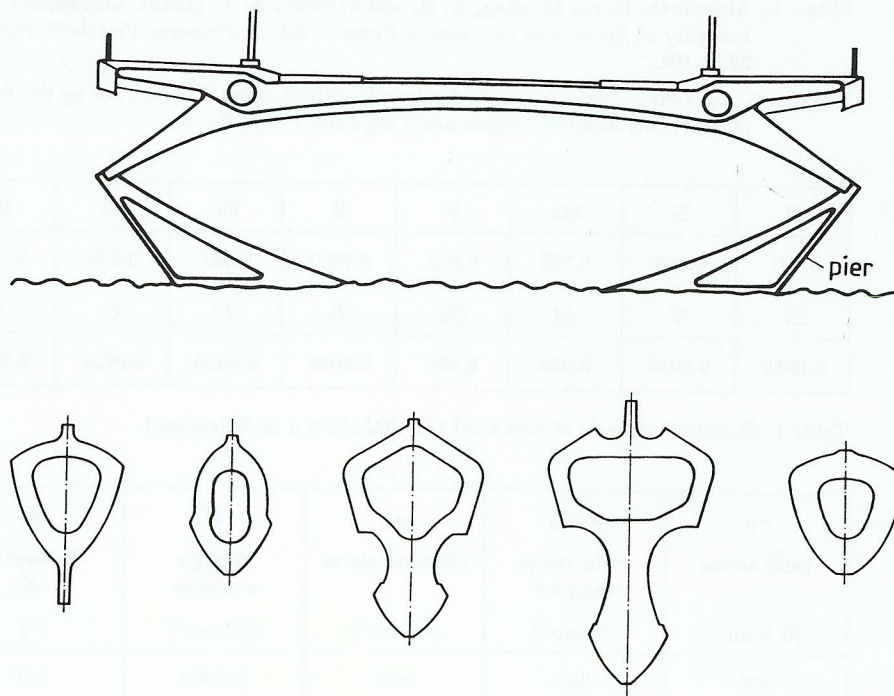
Transverse section of the bridge with various cross-sections of the casted piers
